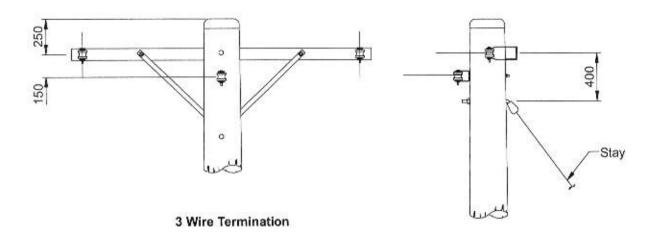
Cable to Open Wire Structure. (Where open wire conductors are terminated and multicore cable is used in the last span to a building or structure)
